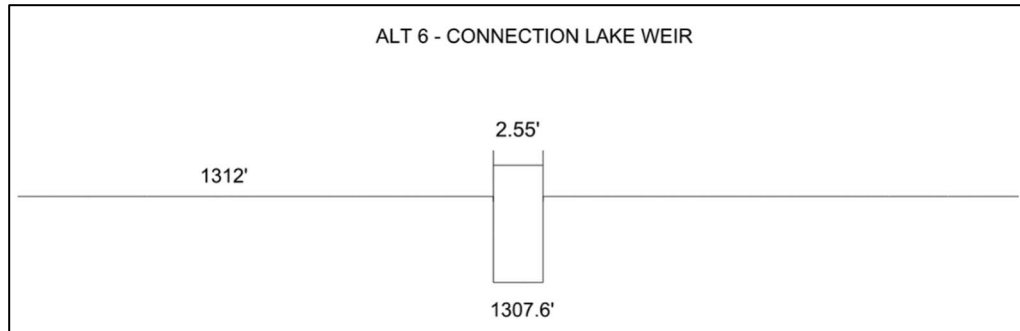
Alternative 6 Connection Lake Outlet Structure Layout
